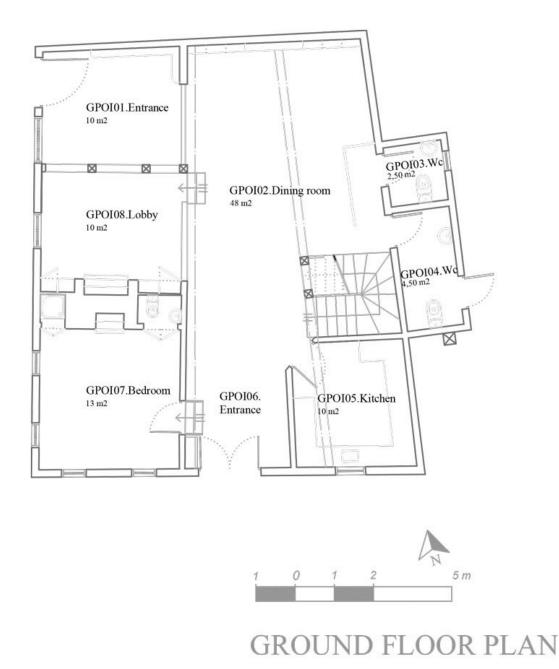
Post-intervention ground floor layout of Abdi İbrahim house. (Author,
